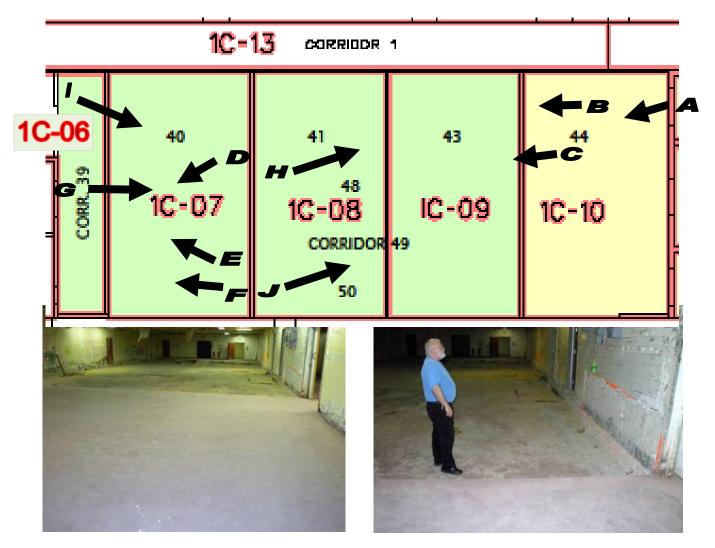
T Bldg. Rooms 39–44 and 48–50 View A Figure C-39. T Bldg. Rooms 39–44 and 48–50 View B
